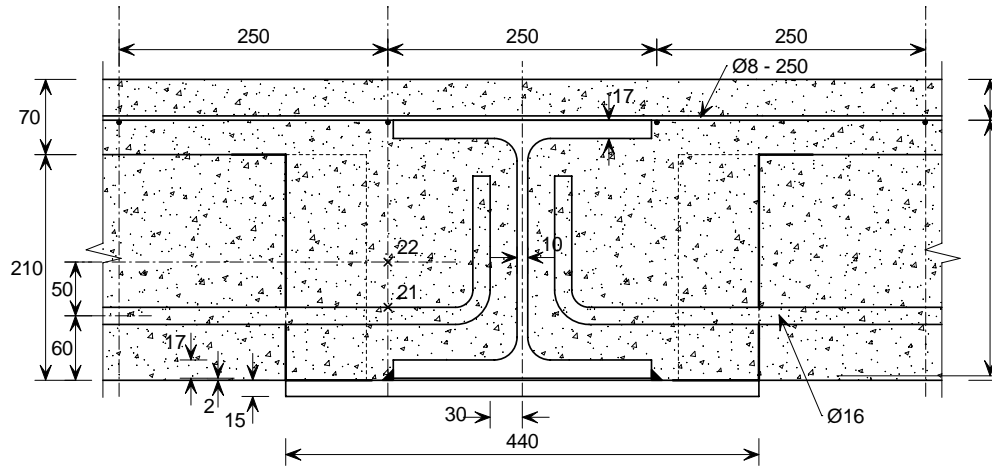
Location of thermocouples on the reinforcement over the internal beam at position A
